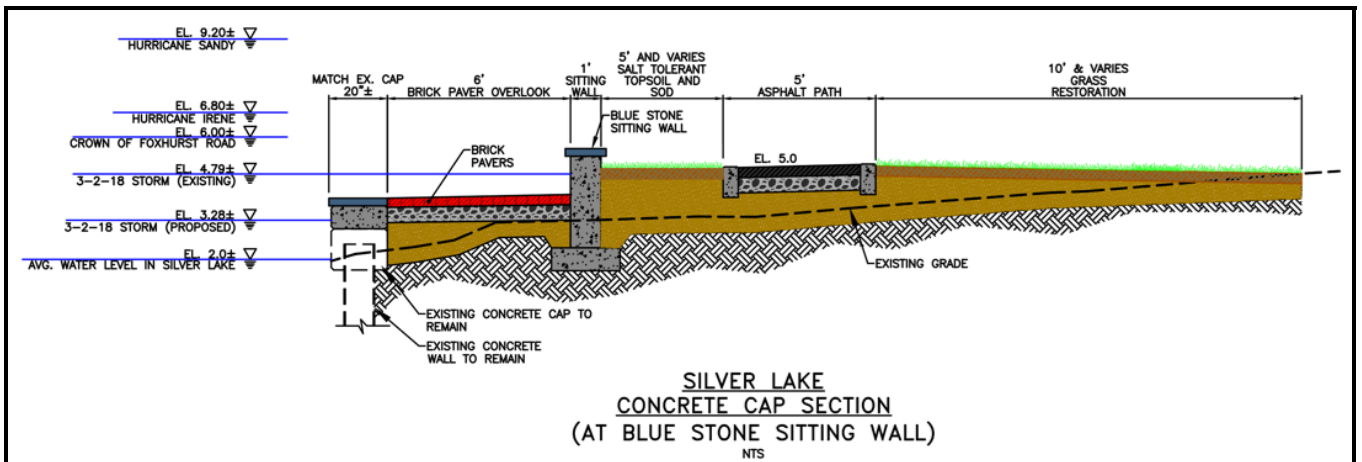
Conceptual Sections at Elevated Perimeter Walkway
